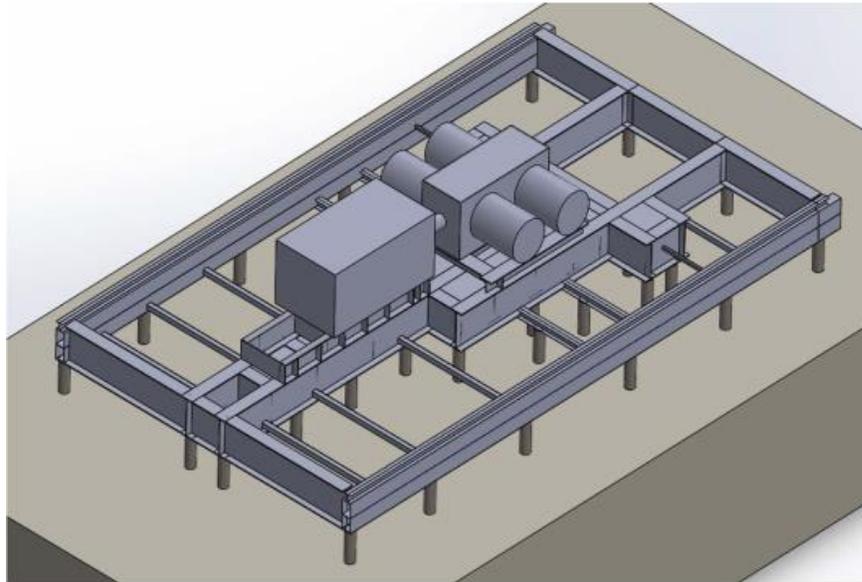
Equipment mounted on a fabricated steel skid supported by driven steel pilings.
